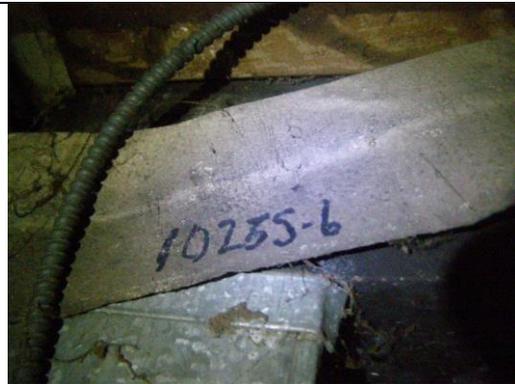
Seam Tape (1025S-6) Basement. 65% Chrysotile Asbestos Detected.
